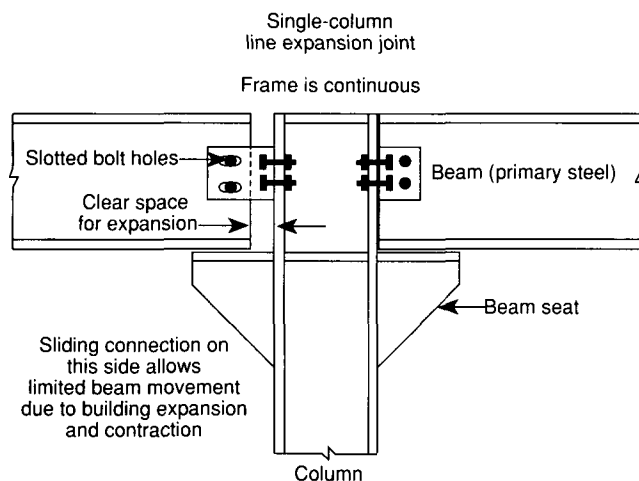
(e) Single-column line expansion joint frame is continuous.
